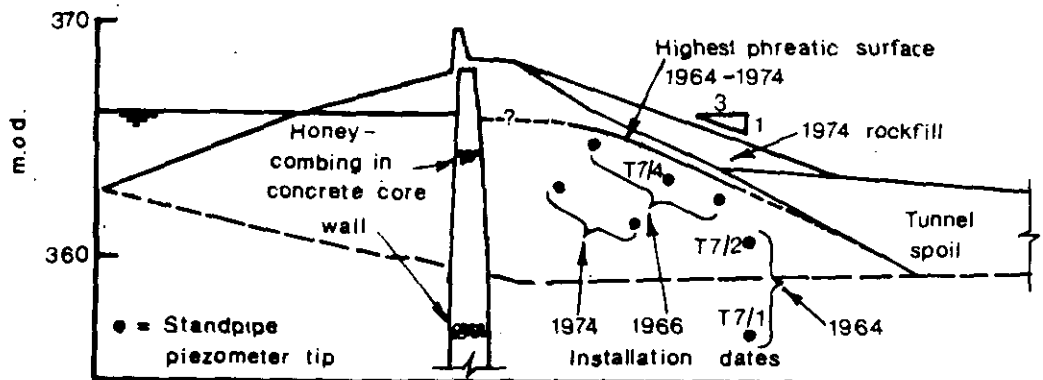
Left Bank Section E-E Water Levels and Additional Works
